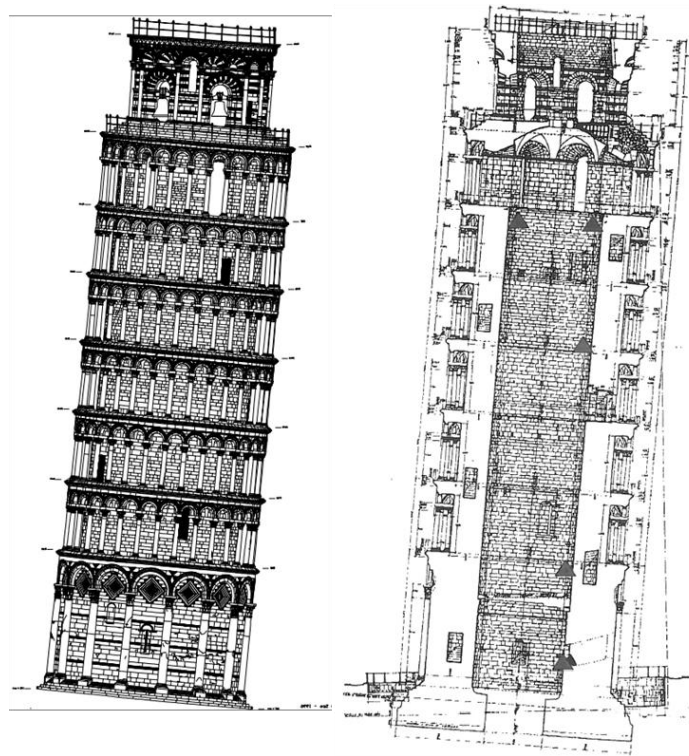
Elevation and section of the Tower, N-S direction ([74][79])
